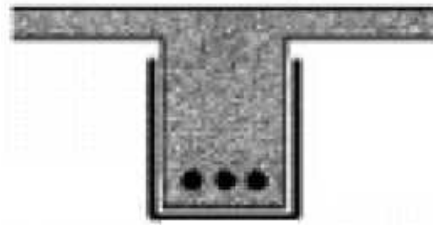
Continuous Fiber Sheet Bonding
